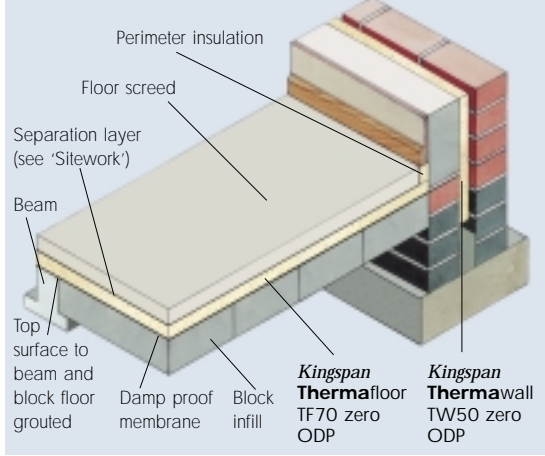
UNDERFLOOR HEATING - INTERMITTENT HEATING CYCLE APPLICATIONS - BEAM AND BLOCK FLOOR
